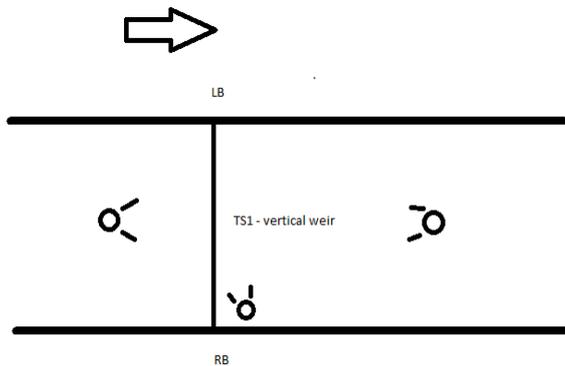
Site plan for Twickenham Barrier 2
